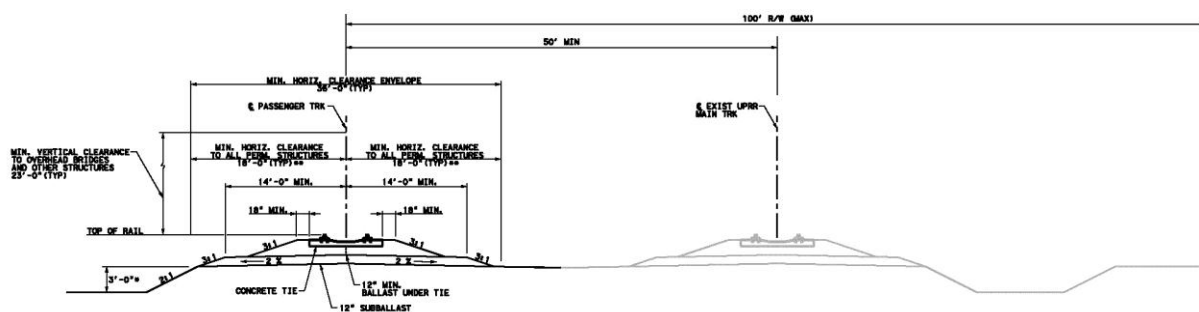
Possible Track Typical Section Along Existing Freight Corridor (single mainline)
